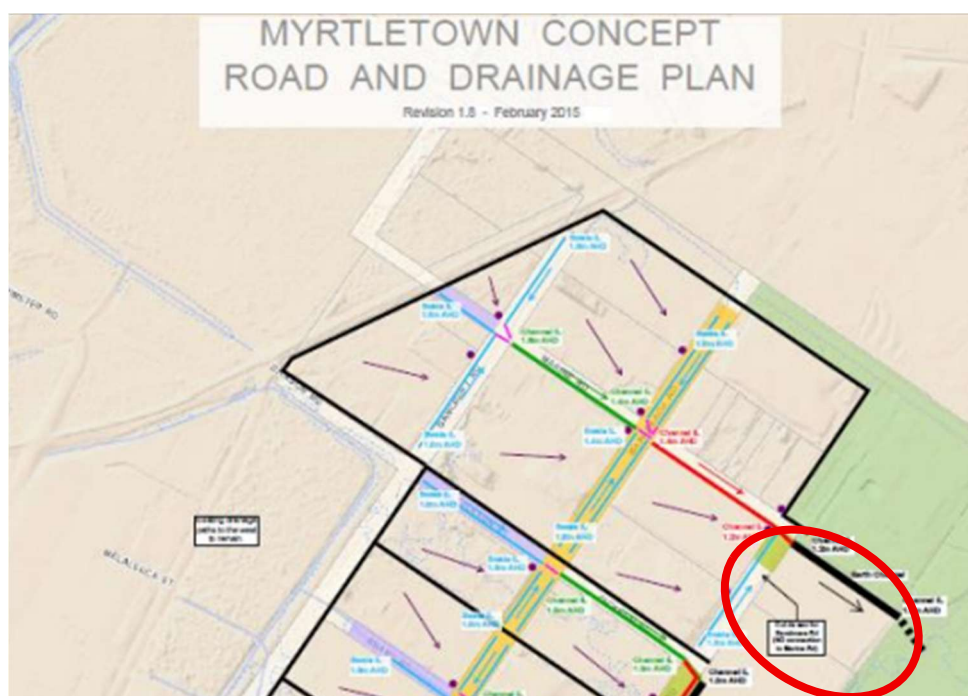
Myrtle-town Structure Plan - Drainage and Fill Revision 1.8 from February 2015
